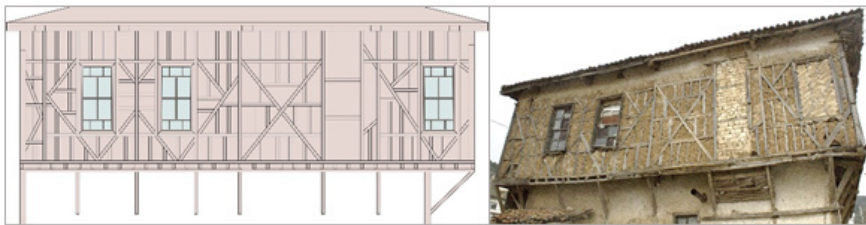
Appearance of the wooden frame construction technique of the houses
